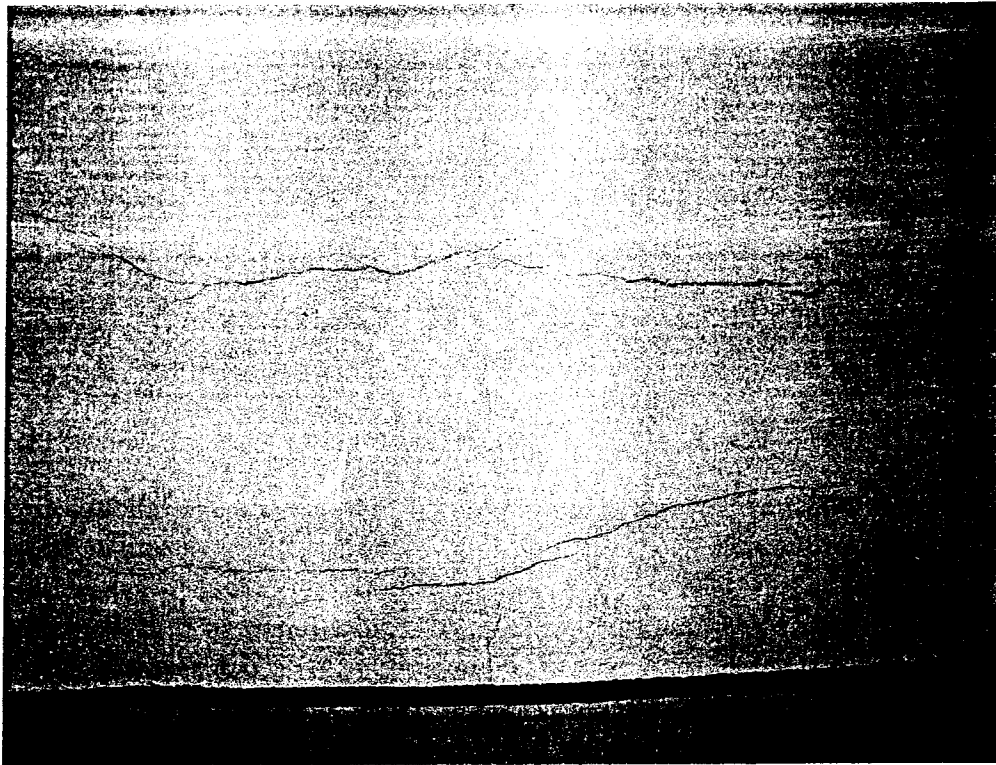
Longitudinal Cracks in the Lower Bleacher Support Beam
